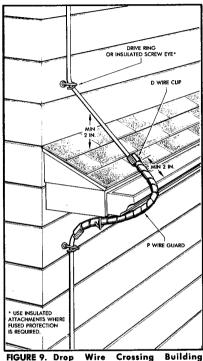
Drop Wire Crossing Building Overhangs and Gutters
